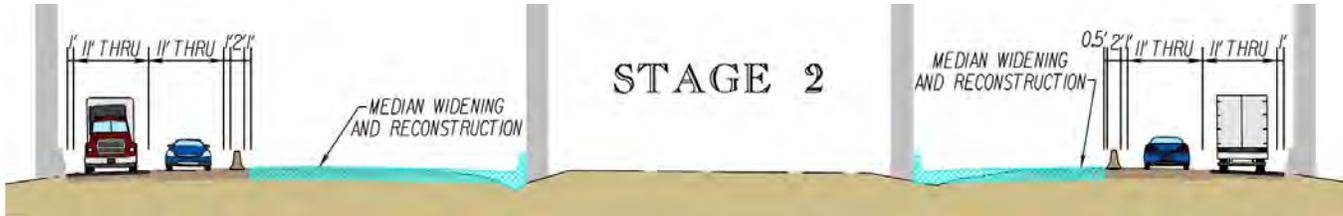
Stage 2 Traffic Condition Under Bridge at Exit 205
